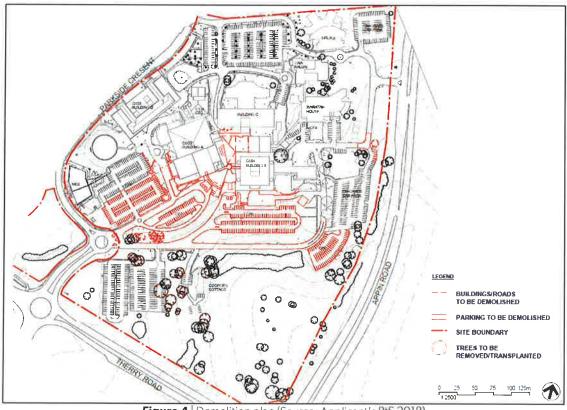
| Demolition plan (Source: Applicant's RtS 2018)
